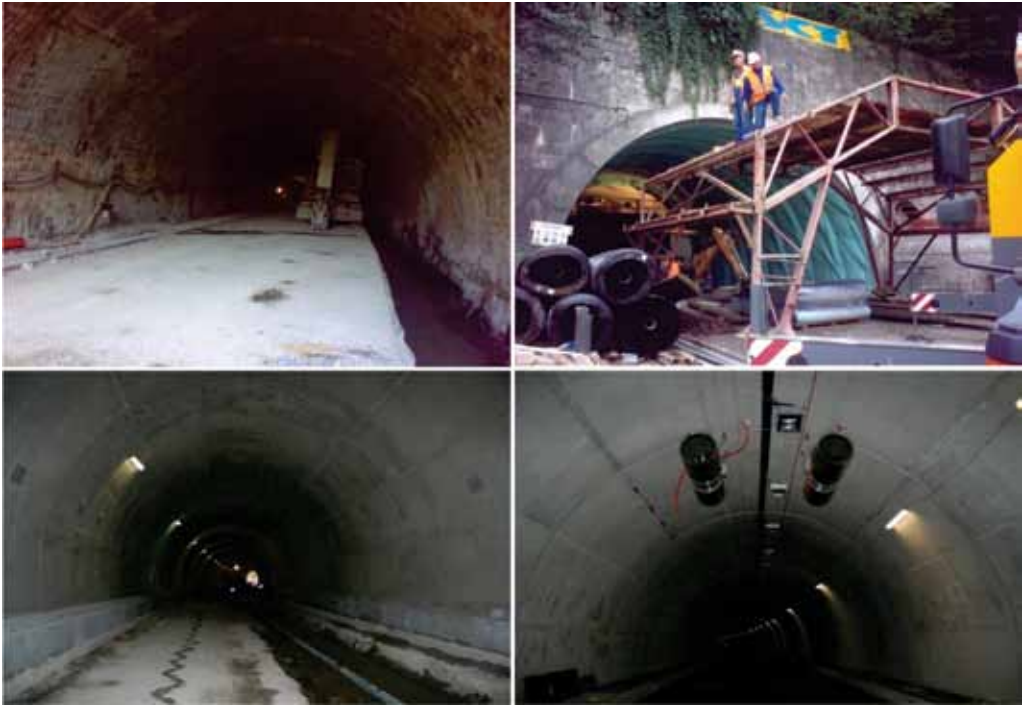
View an excavation for the installation of a new foundation and preparation for the installation of inner lining in the substructure roads and laying asphalt pavement and installation of electrical equipment in the reconstruction of the tunnel.
